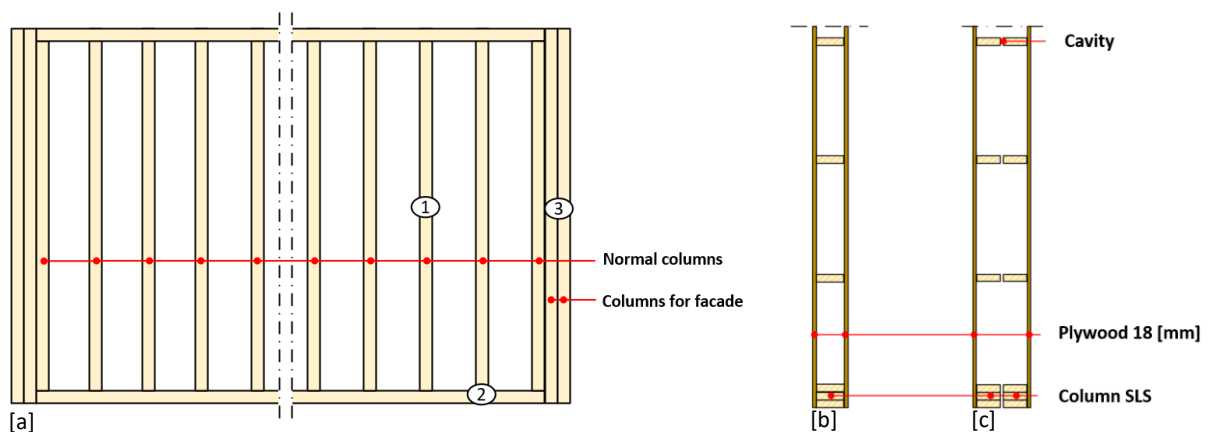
Structural design of HSB wall; [a] Side view; [b] Top section single wall; [c] Top section housing separation wall (Self-produced).
